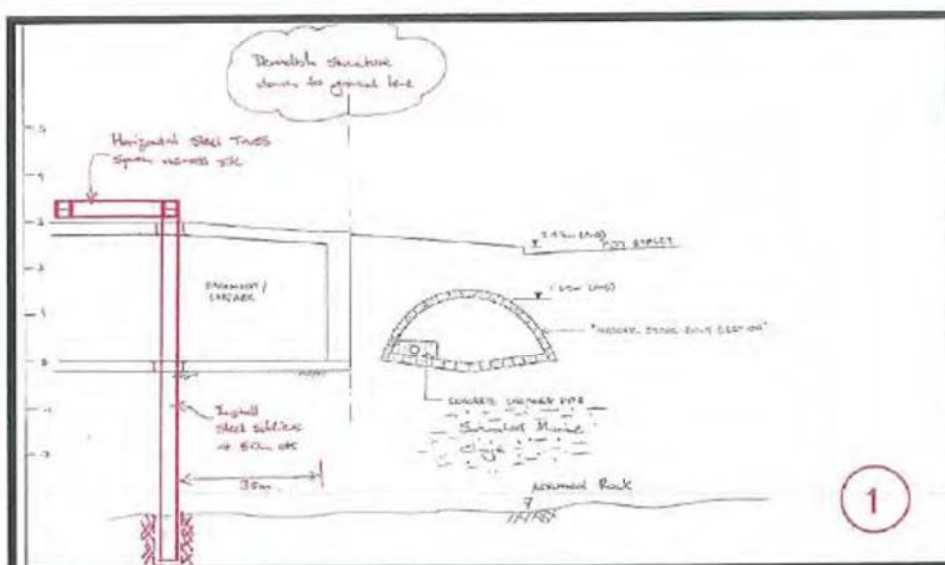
Northrop Engineering plan showing the basement with temporary shoring. Rappoport 2010: 71.
